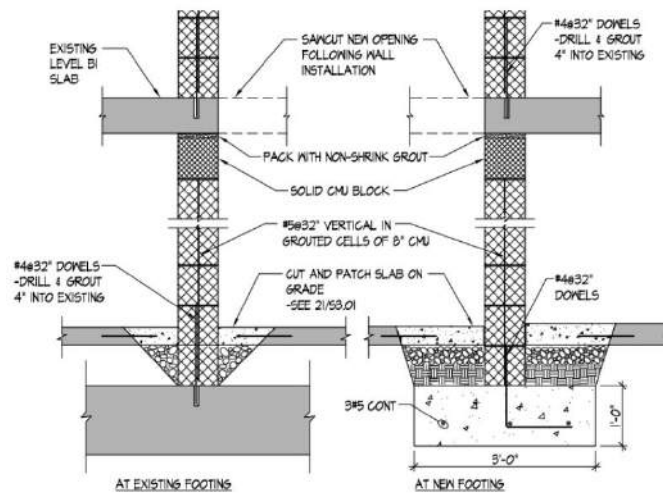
Section through new load bearing CMU Walls. Existing slab was cut to allow walls to bear on existing or new footings. From Drawing 1/S3.02
